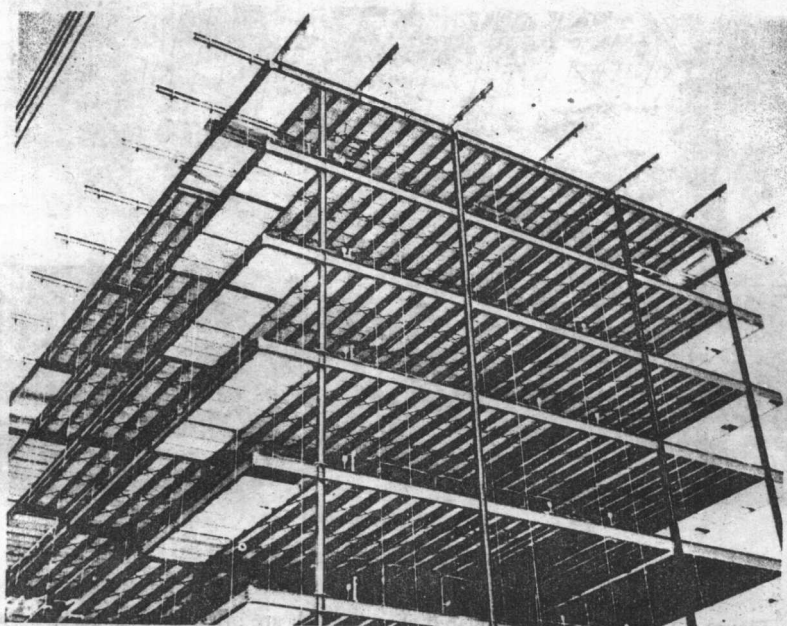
Cold-formed steel joists used together with hot-rolled shapes. (Stran-Steel Corporation.)
